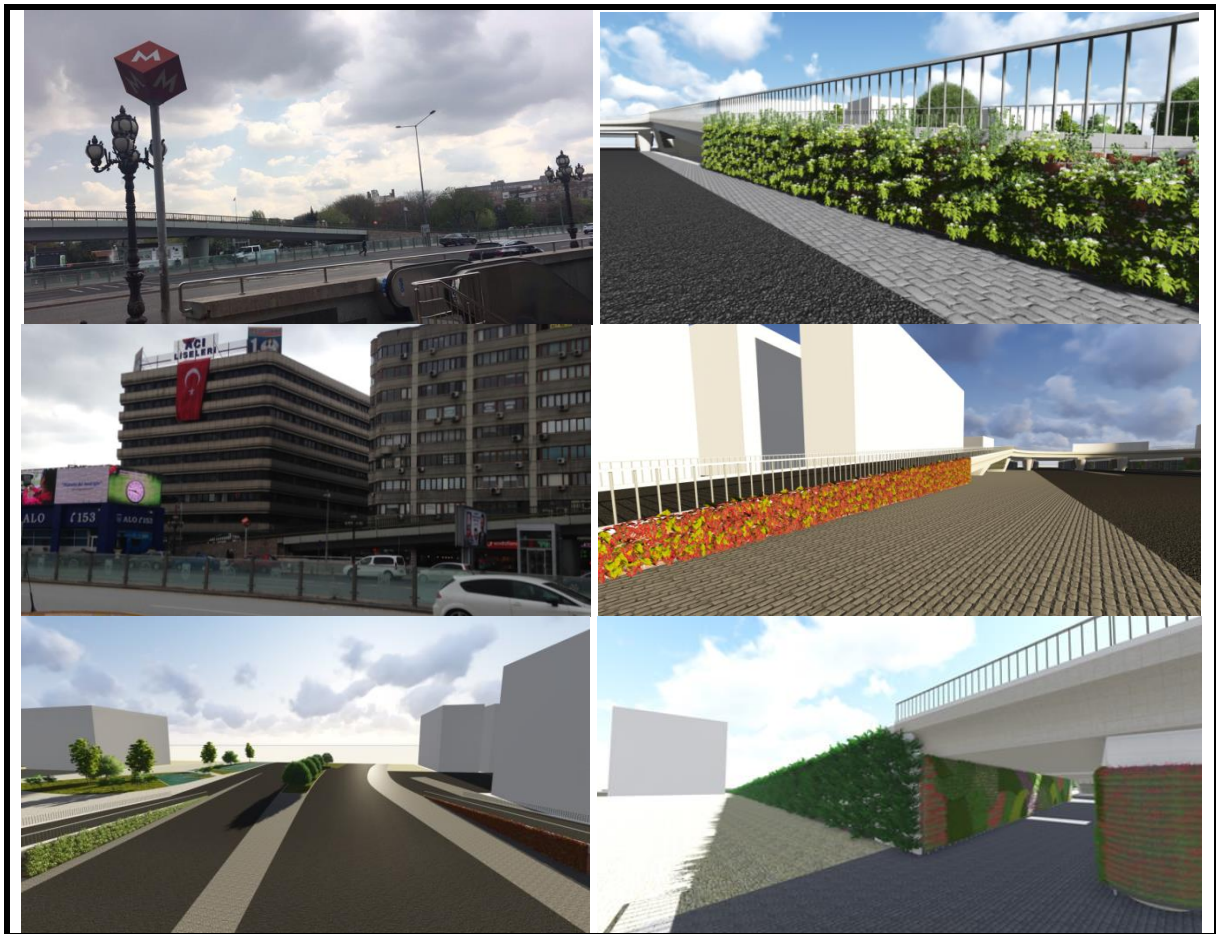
Vertical garden design of Sihhiye Bridge - 1 (Original)
